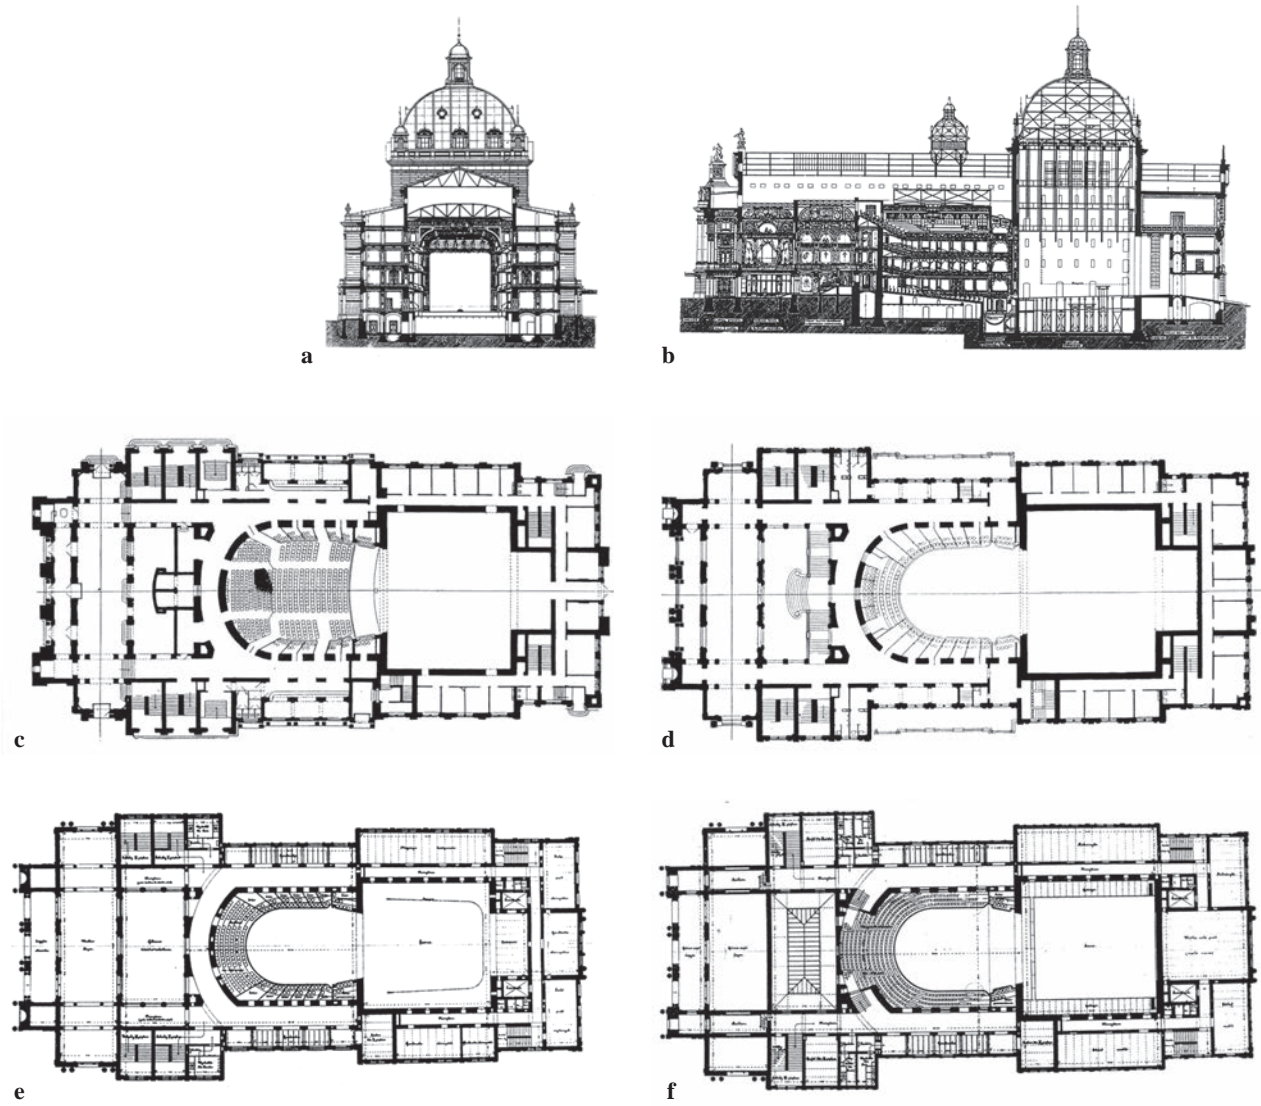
Sections and plans of individual floors of the theater [9]: a) cross section; b) longitudinal section; c) ground floor plan; d) first floor plan; e) second floor plan; f) third floor plan
